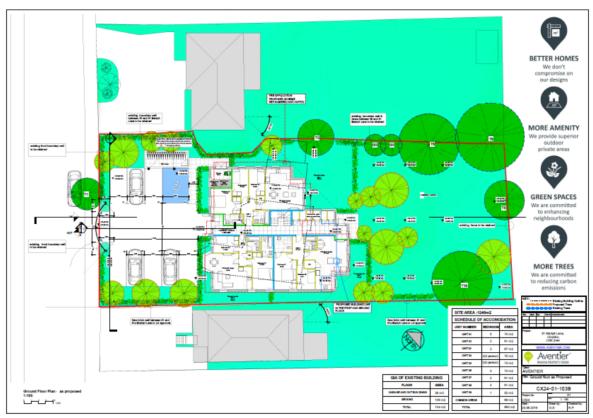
Ground floor plan proposed site showing proposal in relation to neighbouring properties
